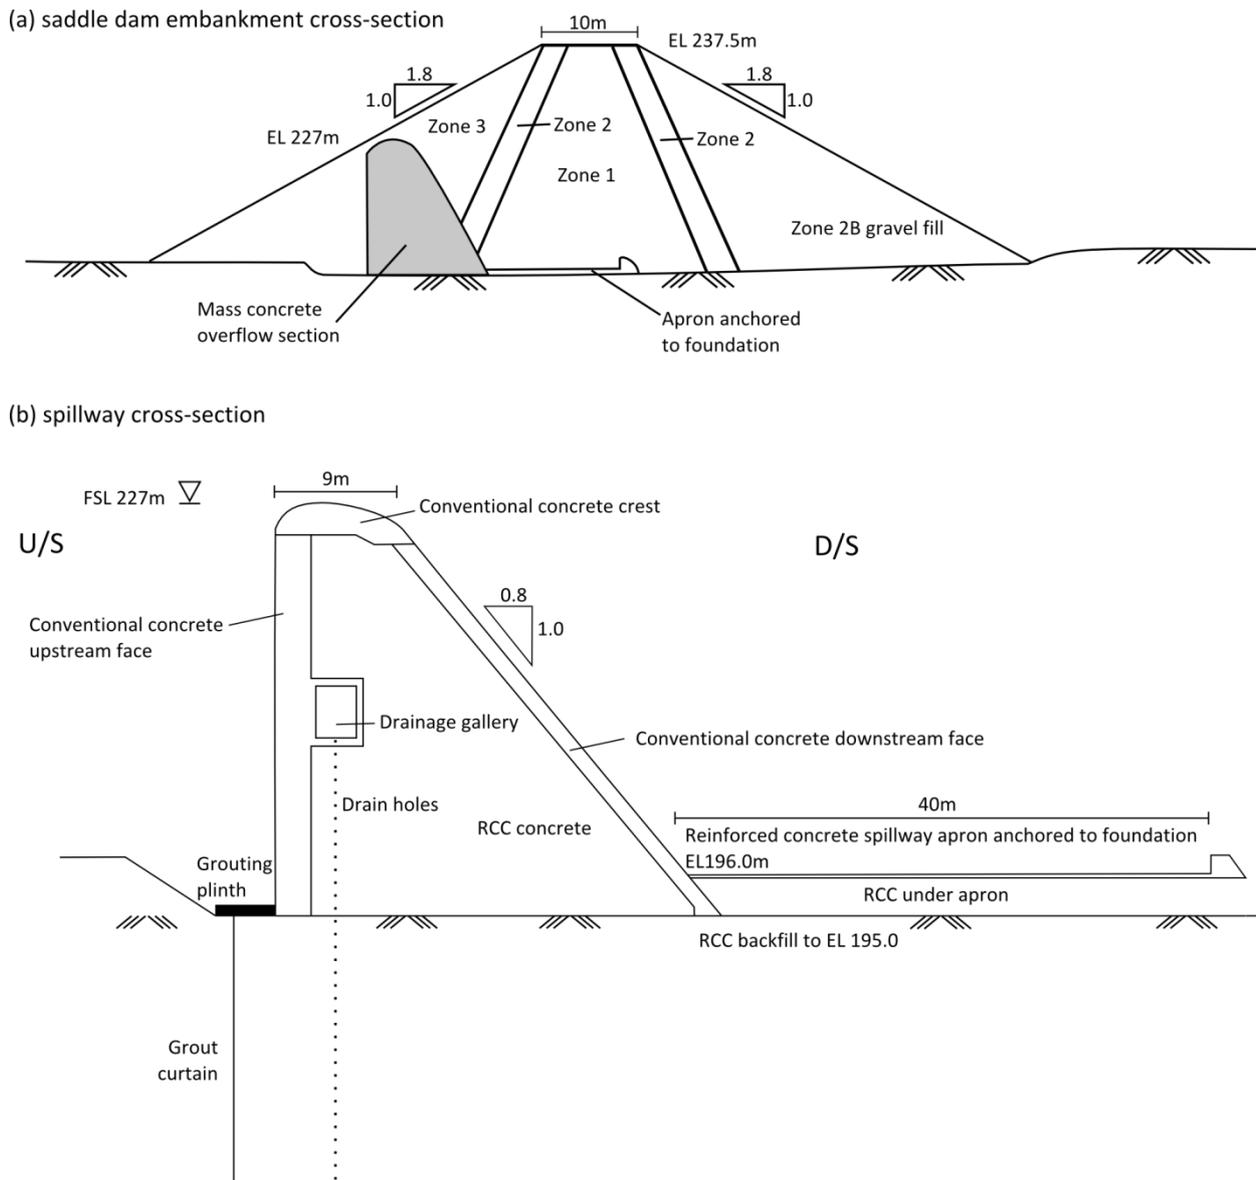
Embankment and spillway cross-sections for Dagworth dam
